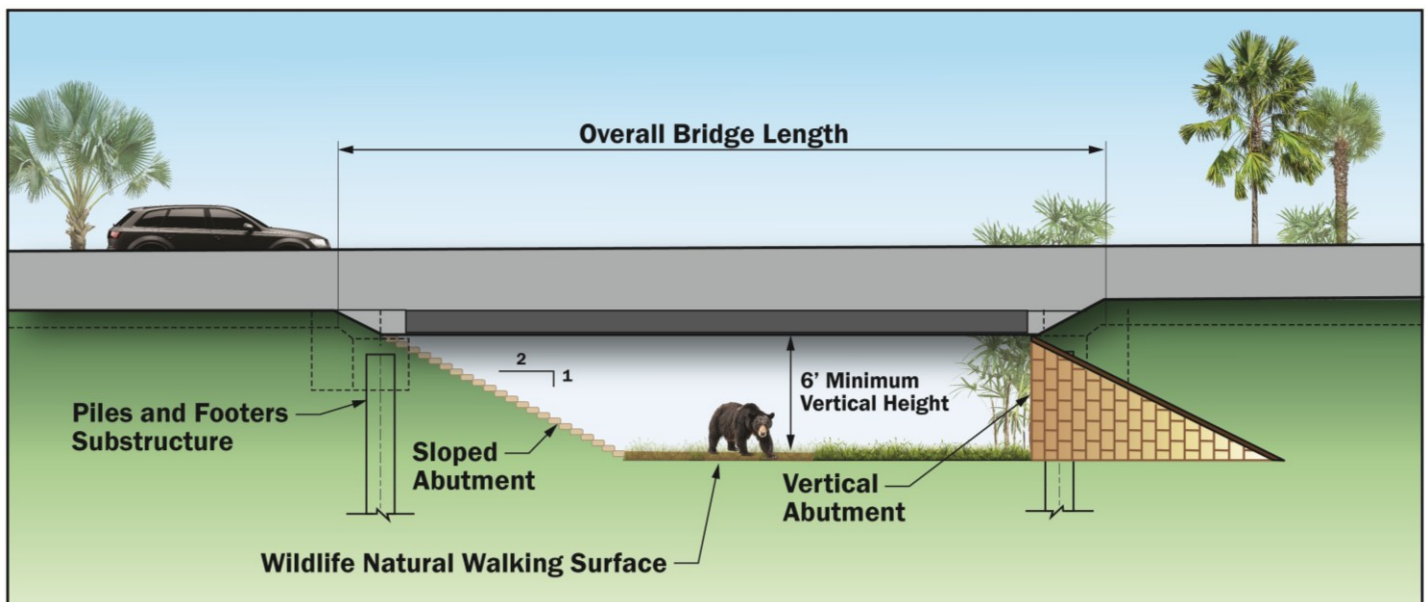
Wildlife Underpass with a dry crossing underneath the highway bridge. Two potential bridge abutment designs are depicted above: a sloped bridge abutment (left) and a vertical abutment (right).
